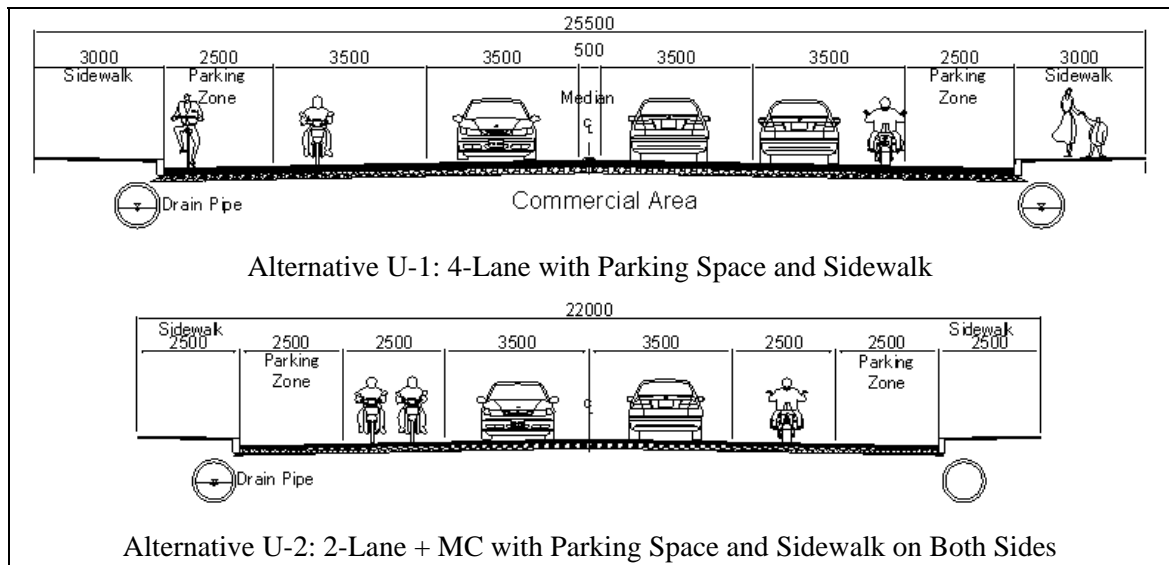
Alternatives of Cross Section for Urbanized Area
